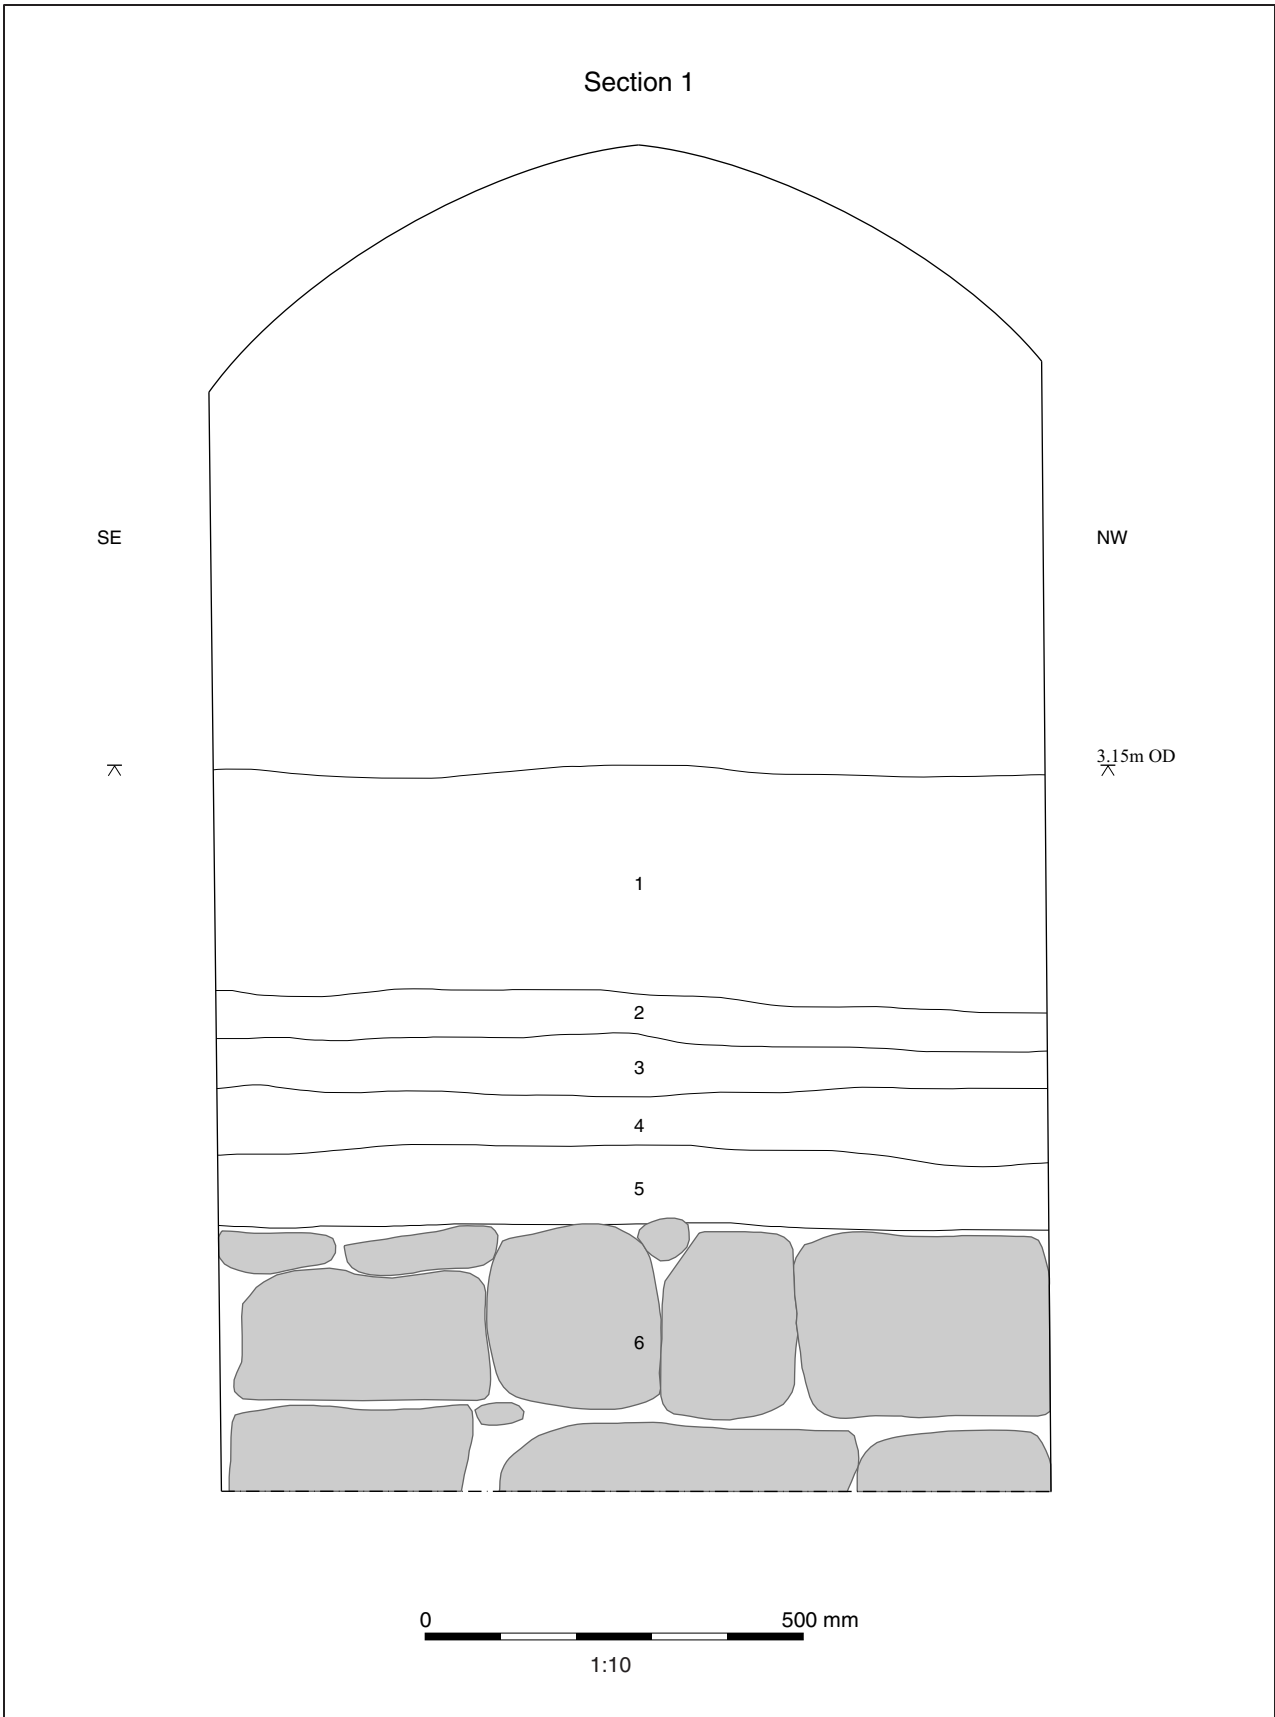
Section of partly exposed limestone wall (6) blocking doorway
